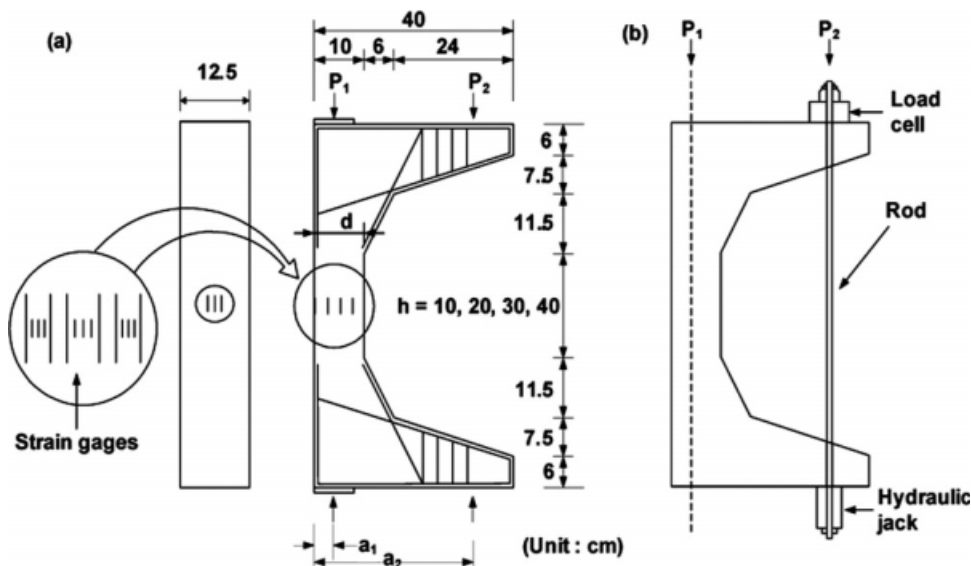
(a) Shape and size, and (b) loading equipment of C-shaped specimen.
